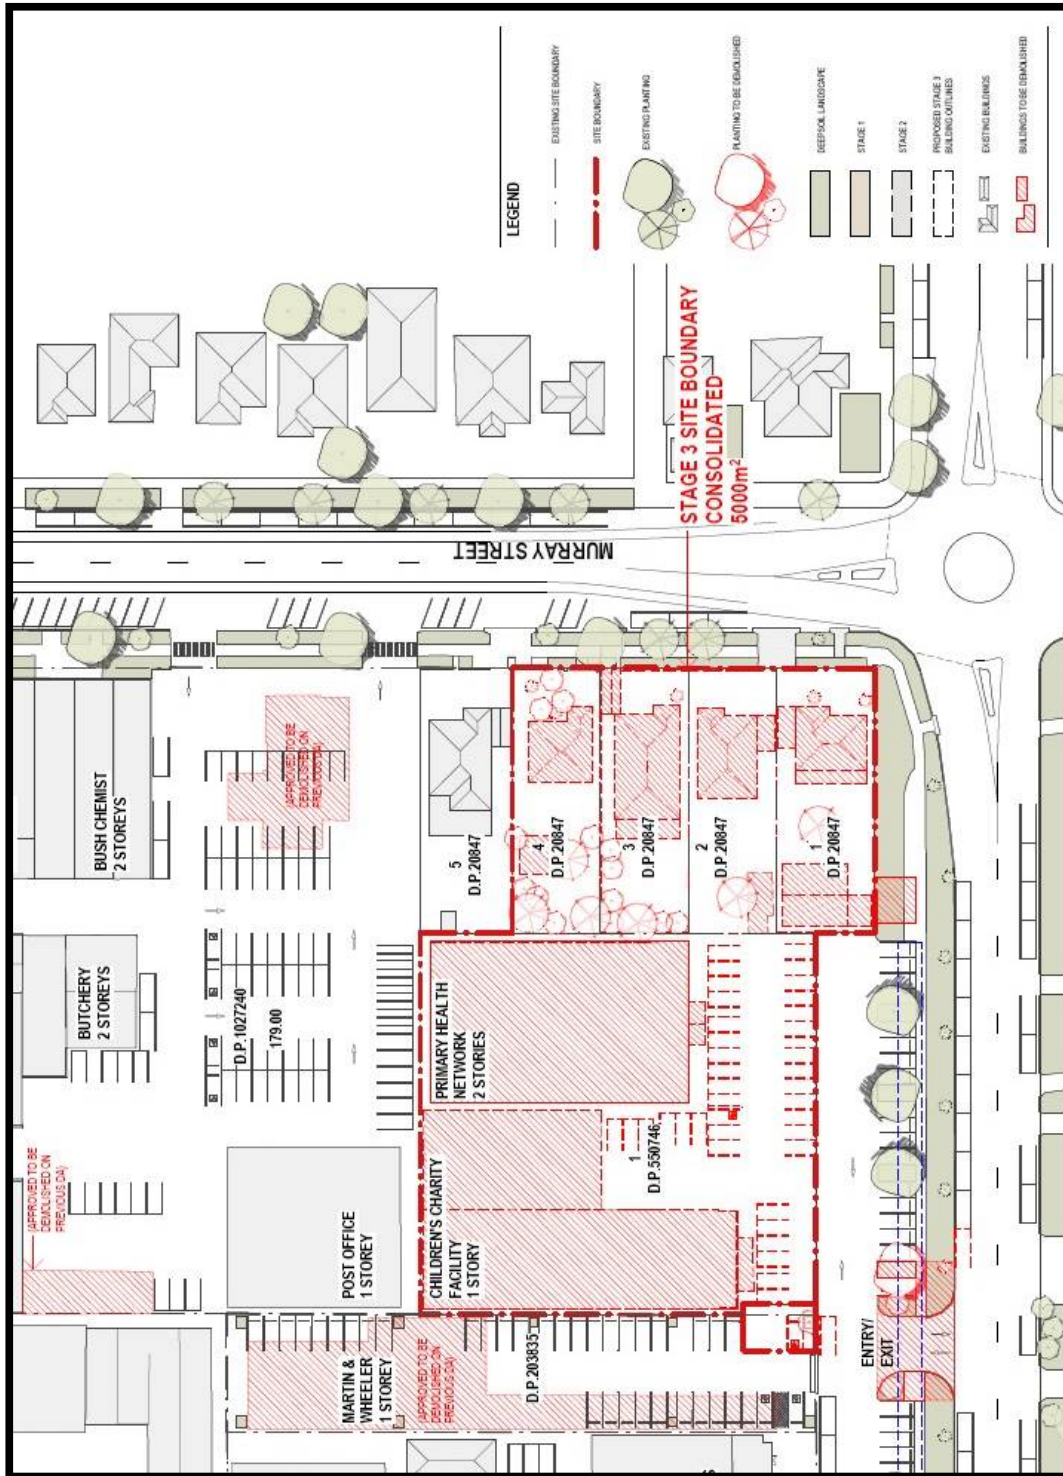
An extract of the CIVITAS Stage 3 Demolition Plan.
